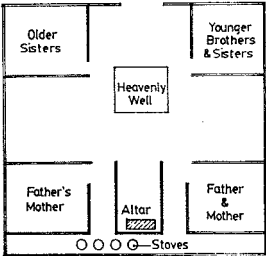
Shop-house floor plan in Southern China (source: Newell, 1962, 102)
